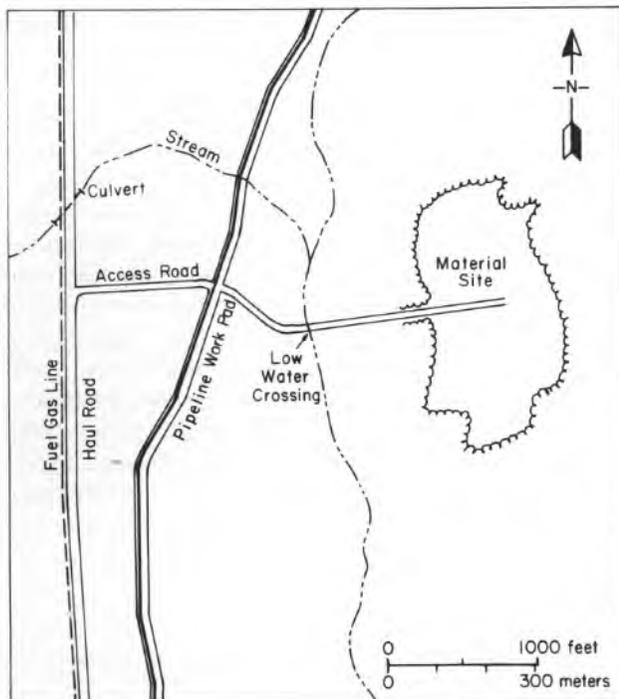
Idealized drawing showing major road and pipeline construction activities.
